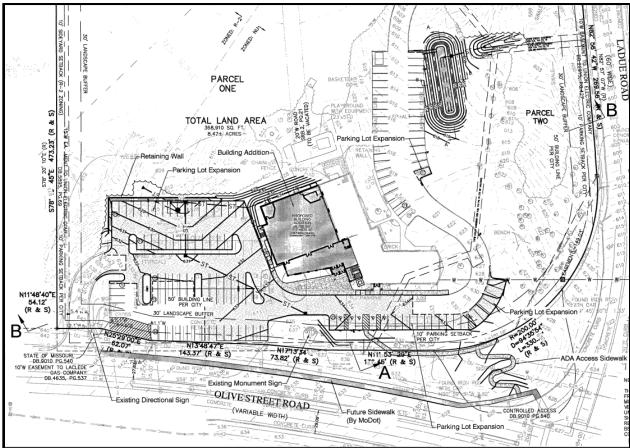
Portion of Site Development Section Plan (Plan Sheet SDP2)
